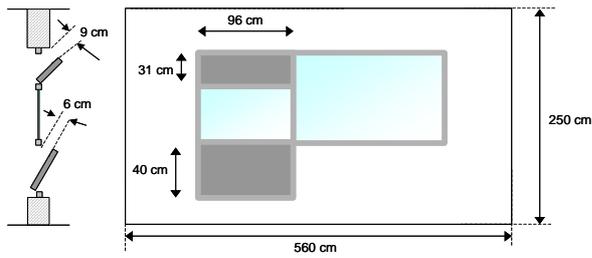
Cross section and front view of the façade with the two panels (shown in grey), opening to the inside.
